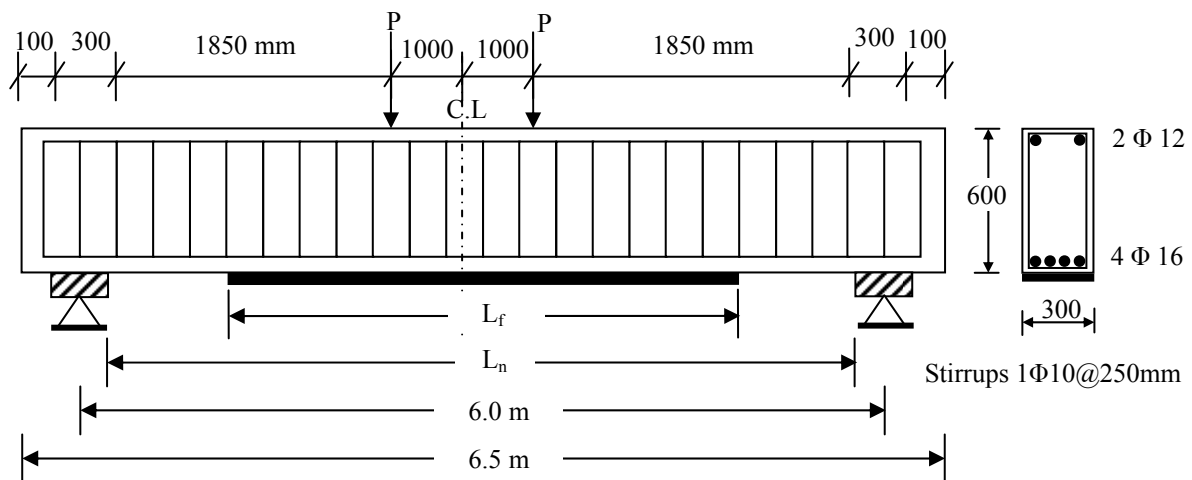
Dimensions and reinforcement details of the full-scale beam used in the present study.
